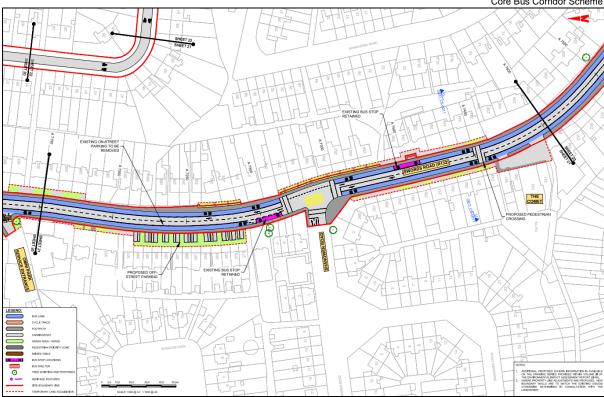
Extract of the Proposed Scheme General Arrangement Drawings (Sheet 21)
